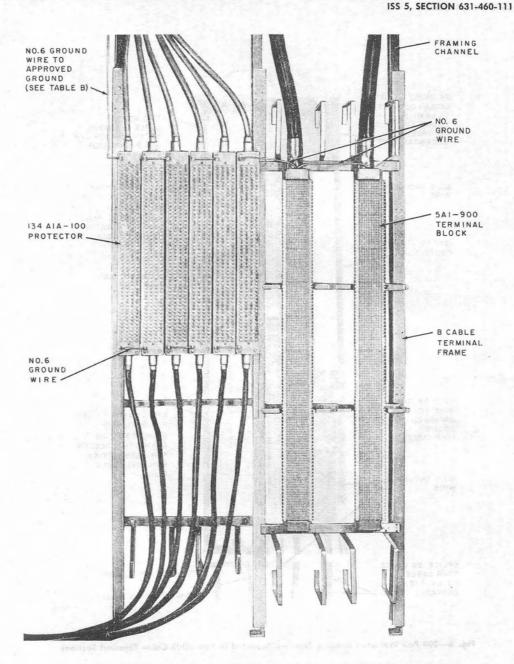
134A1A-100 Protectors and 5A1-900 Terminal Mounted on B Cable Terminal Racks
